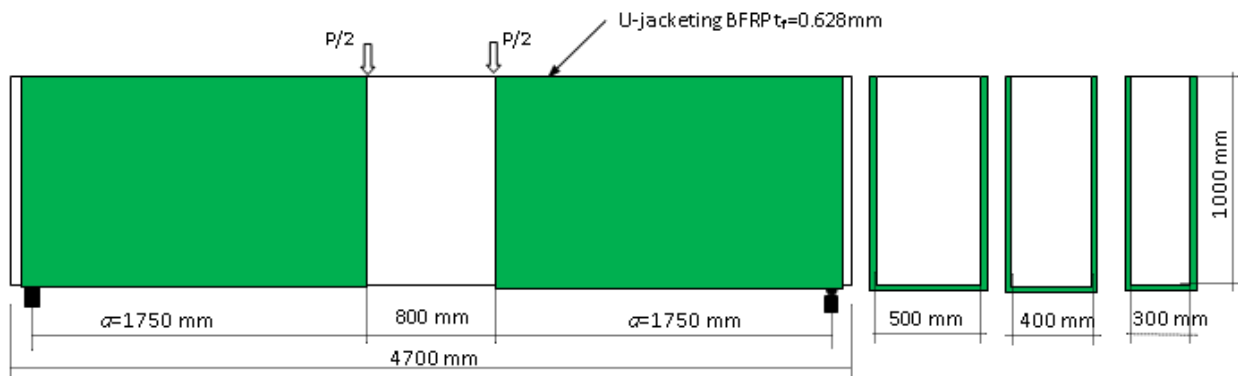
Geometrical details of the RC beams strengthened by U-jacketing with BFRP sheets
